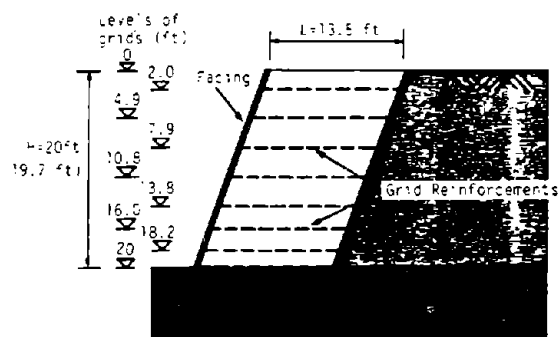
Positions of eight reinforcement layers as calculated in Table B-7. [Netlon Ltd., 1984b]
